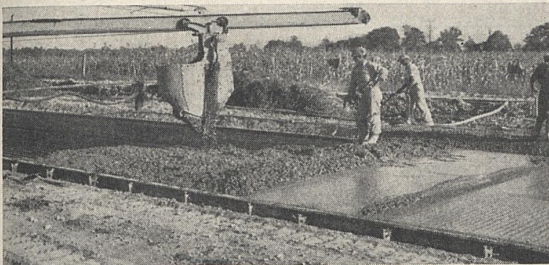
CONCRETE BEING PLACED IN A HEAVILY REINFORCED SECTION.
